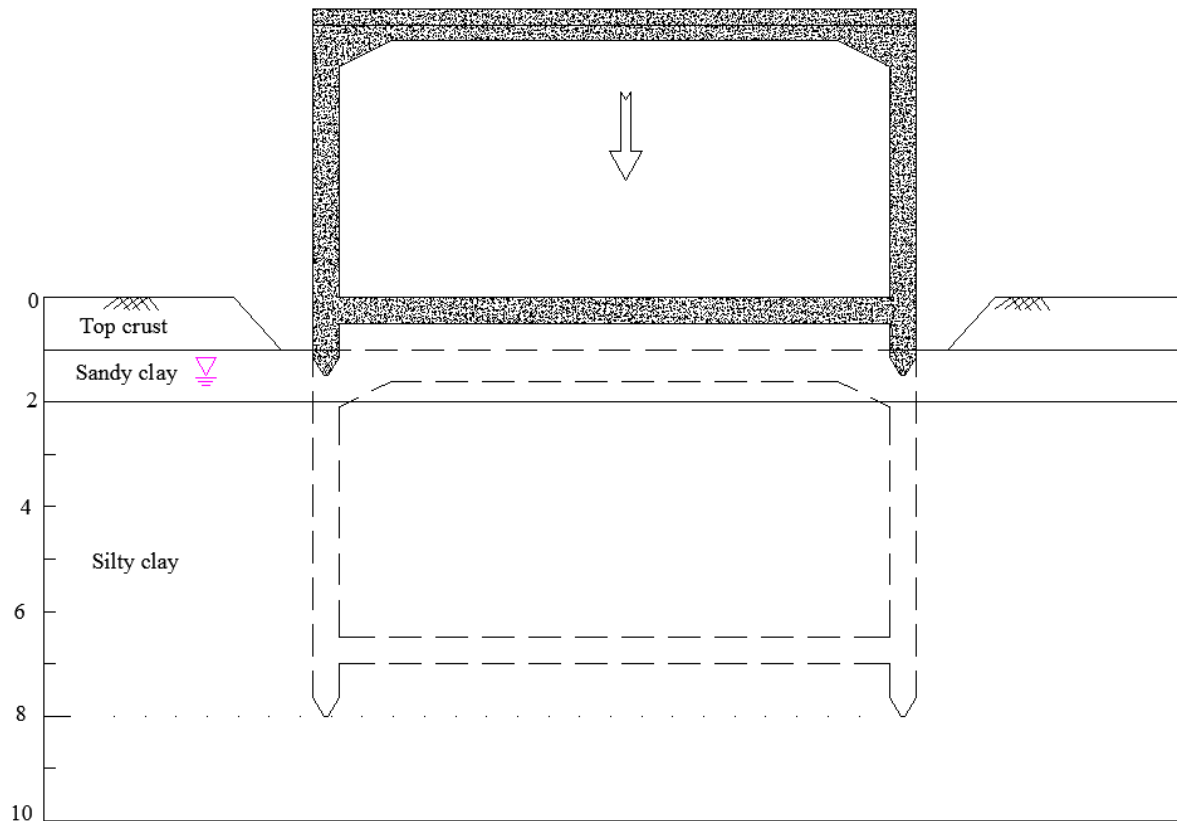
Penetration of Caisson Tunnel into the soil layers
